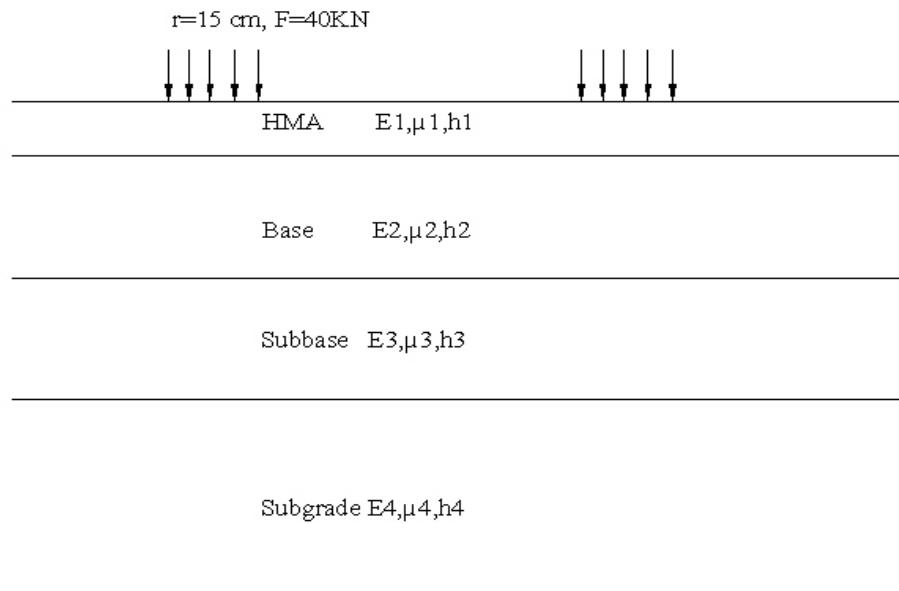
Scheme of Pavement Structure Analyzed in BISAR
